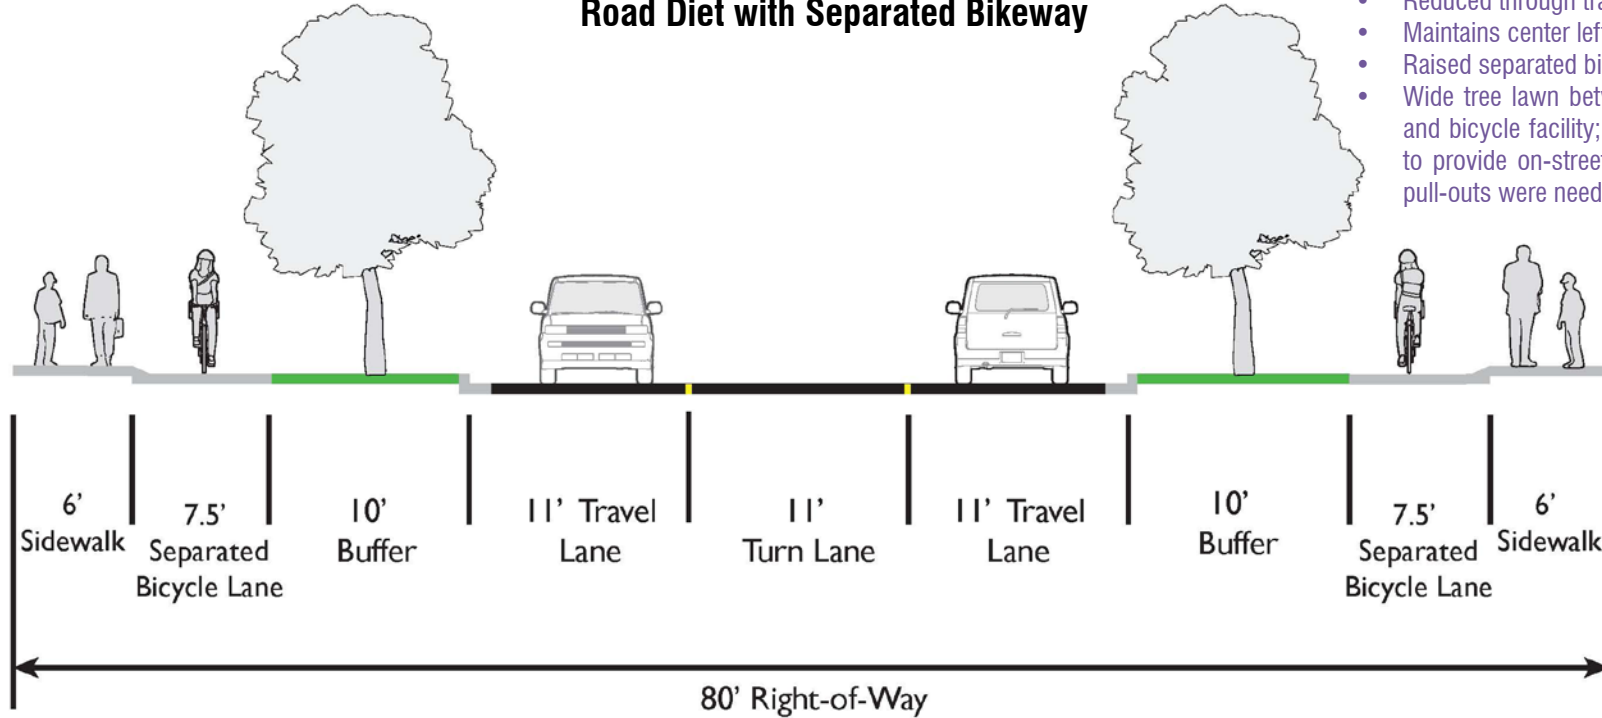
East Residential Zone Road Diet with Separated Bikeway - Section
